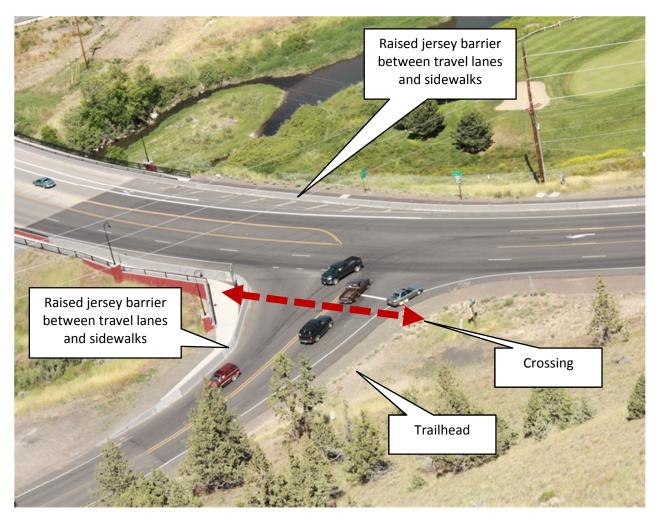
Existing OR 126/O'Neil Highway Intersection configuration.
